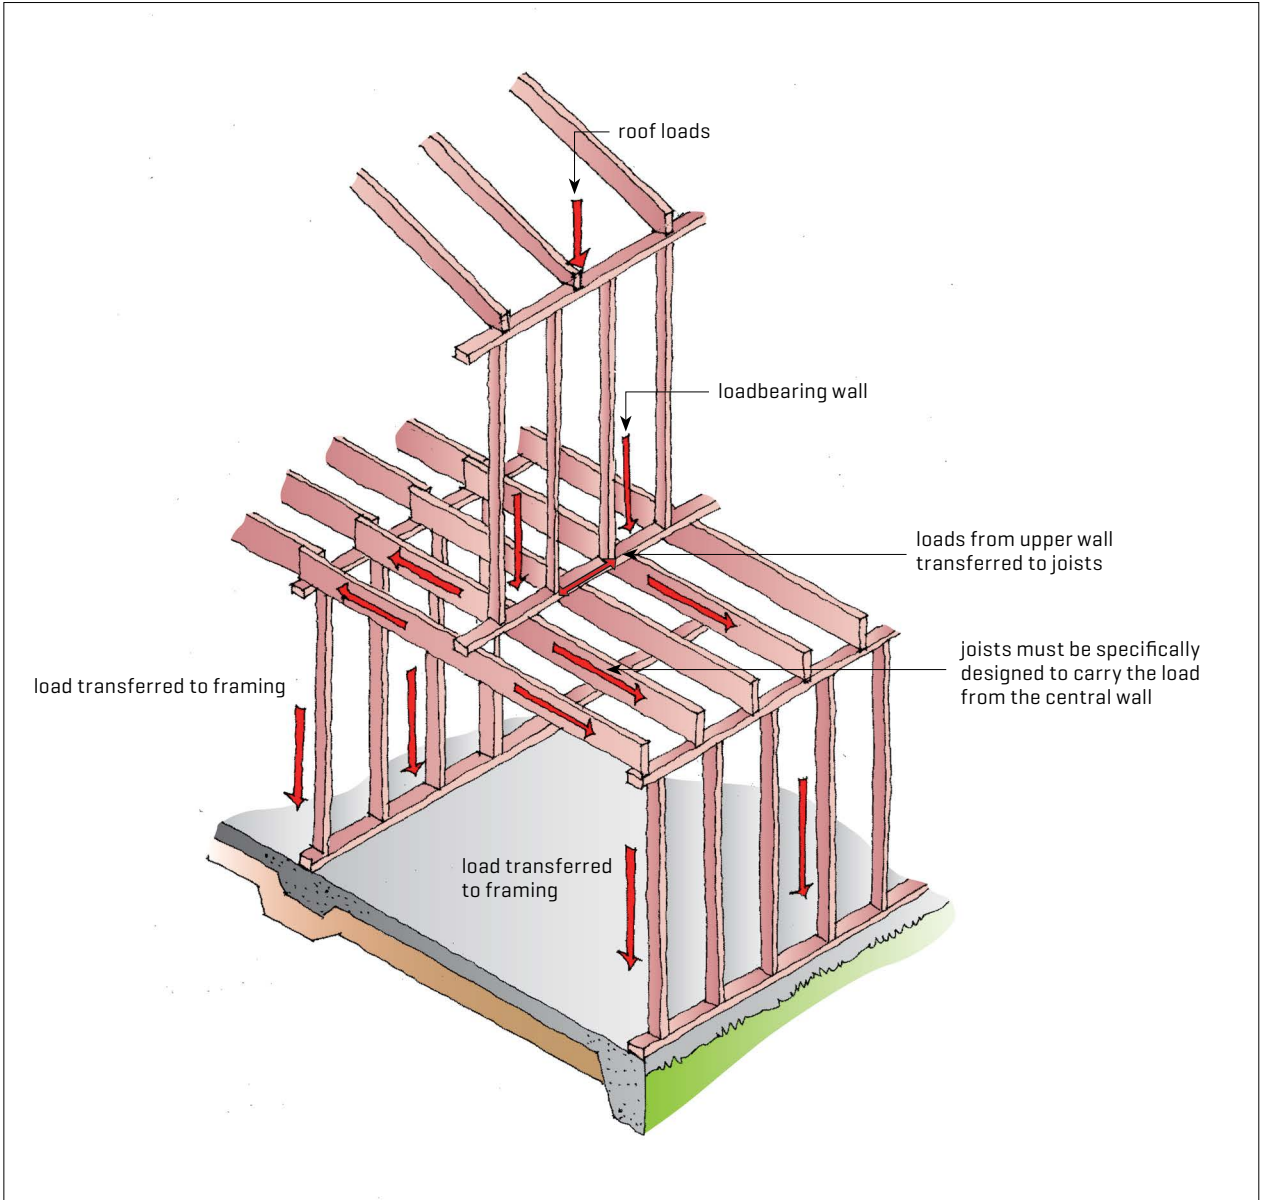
Specific design is required to transfer loads for loadbearing walls supported on joists.
